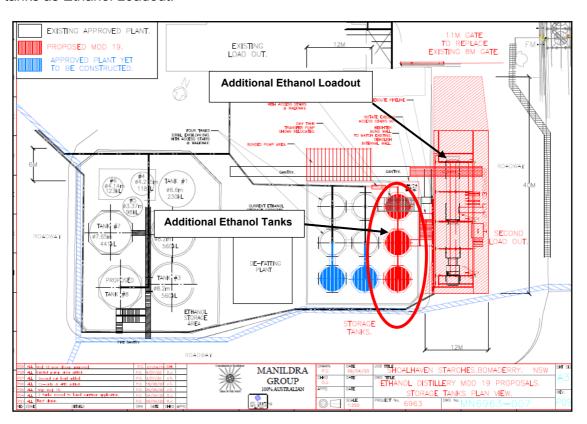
Plan of Location of Additional Ethanol Tanks and Loadout.
